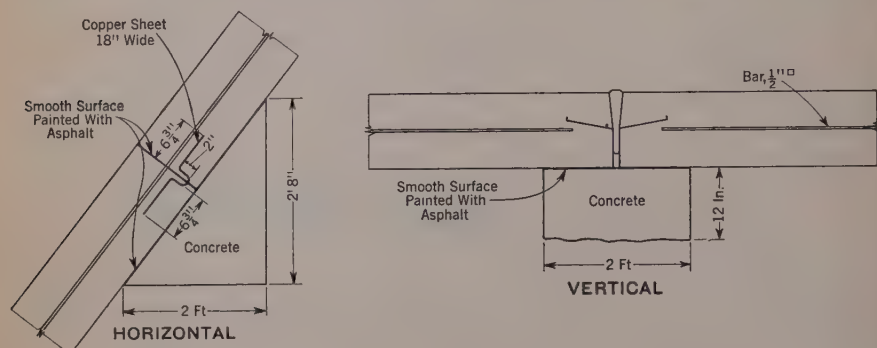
TYPICAL SECTIONS OF PANEL FACINGS, TAXHIMAY DAM
